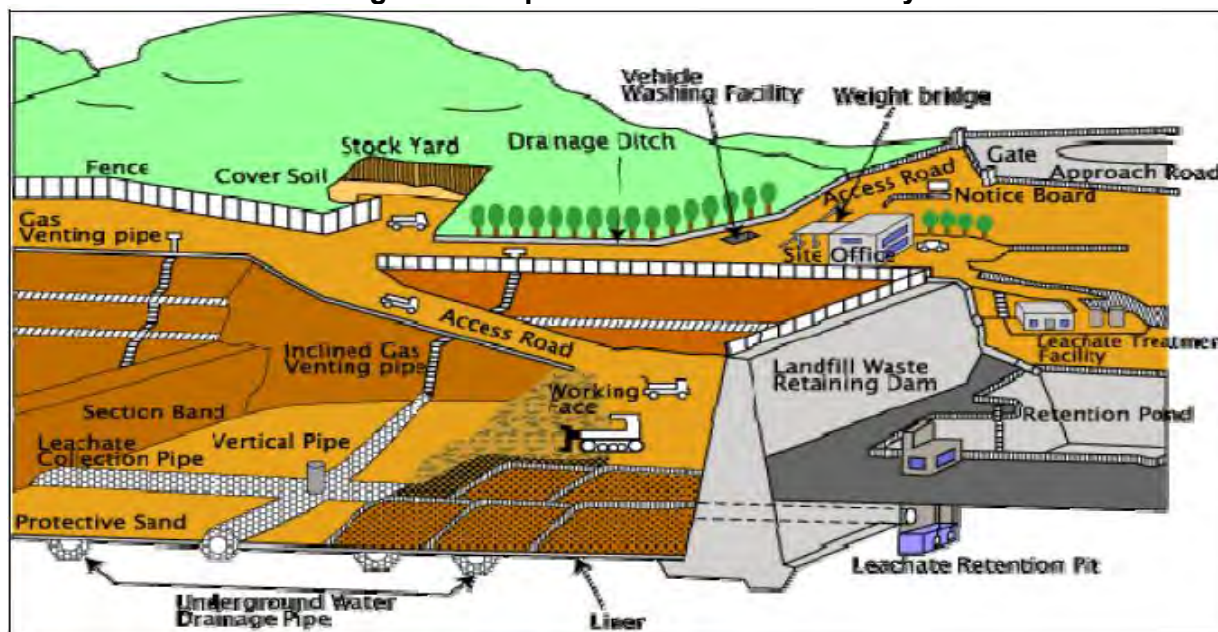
Section details of Capping Plan of Existing Waste Dump Site
